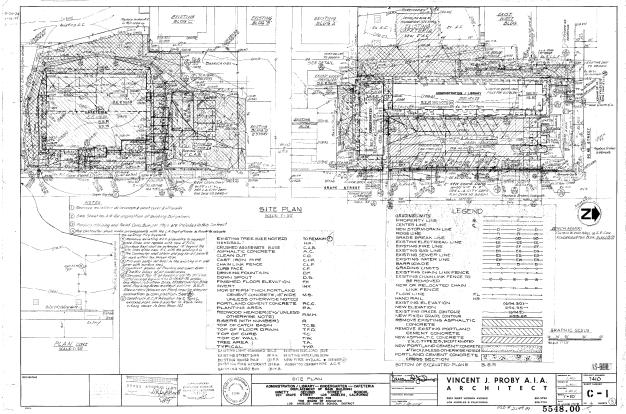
Architectural Plan of Administrative & Library Building/Kindergarten Building and Cafeteria Building SOURCE: LAUSD Vault Drawing No. 5548.00.000 [015]
